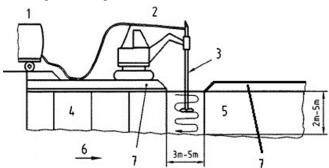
Diagram of mass stabilization of embankment footing on thawing permafrost soils: 1 – tank with a stabilizer; 2 – working machine; 3 – mixer; 4 – treated soil; 5 – thawing permafrost soil; 6 – direction of mass stabilization; 7 – berm
